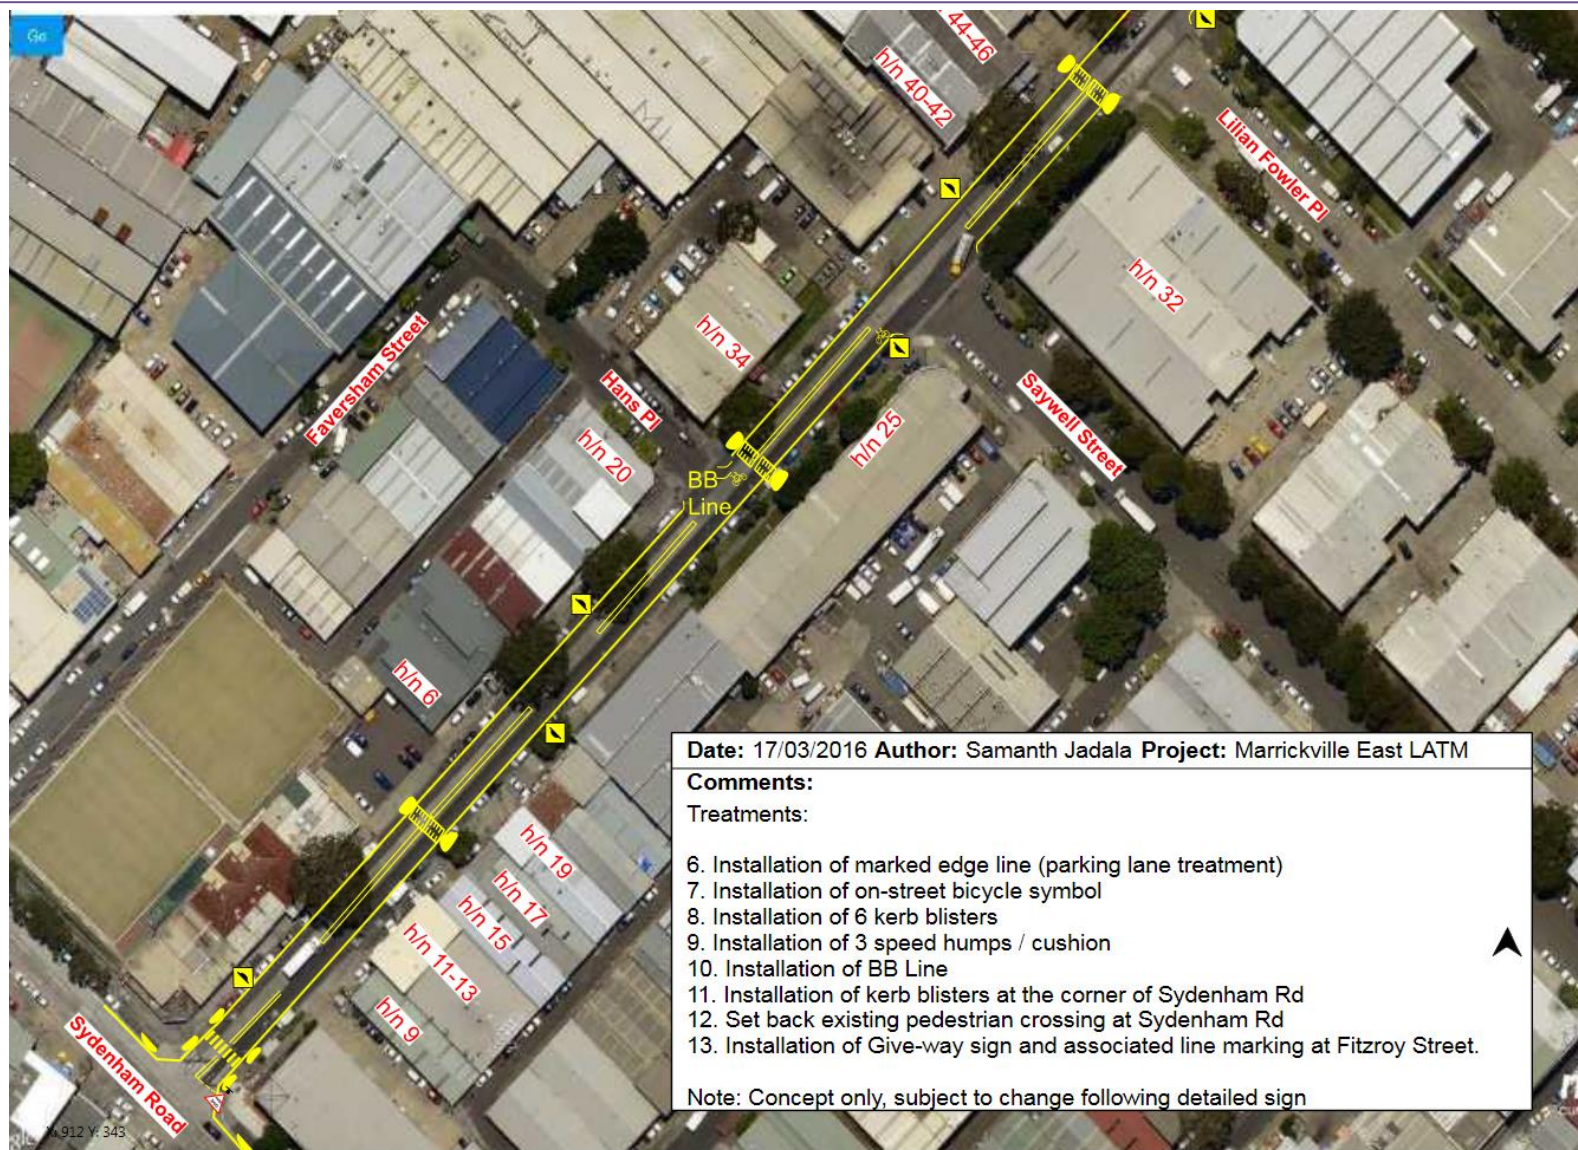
Item 2 - Fitzroy Street from Sydenham Street to Chapel Street
